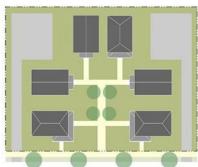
Courtyard Pattern Courtyard patterns allow multiple buildings to front on common open spaces with reduced lot sizes and setbacks, provided all open space design standards are met, provided the courtyard and building maintain frontage design and streetscape standards on a public street.
